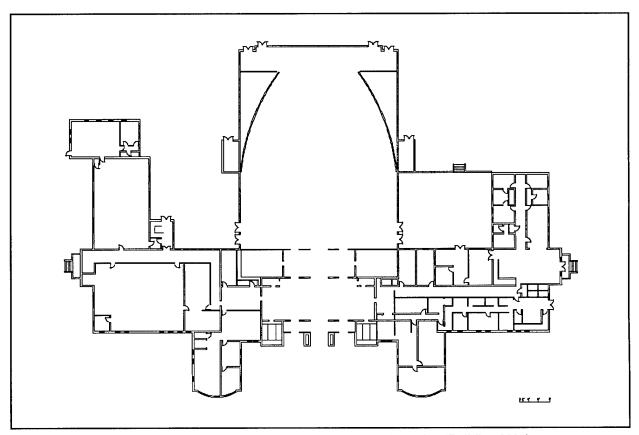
Example of a Georgian Revival administration building floor plan (Building 2034).
